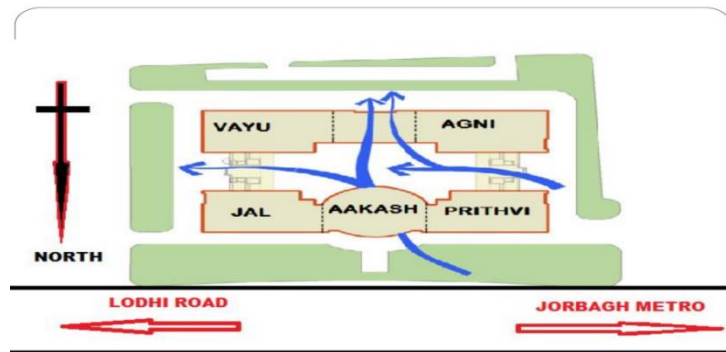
(d) effective ventilation courtyard planning Source : Author
